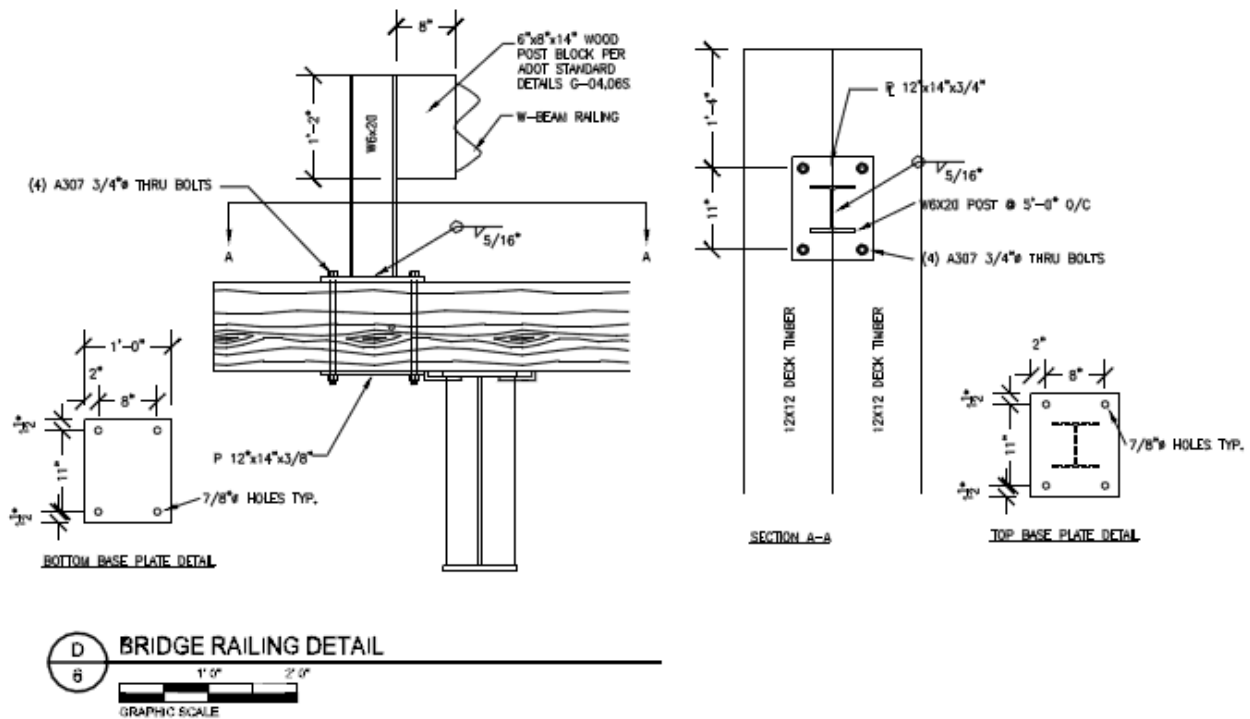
W-Beam Bridge Rail for Temporary Timber Deck Bridge Installations
